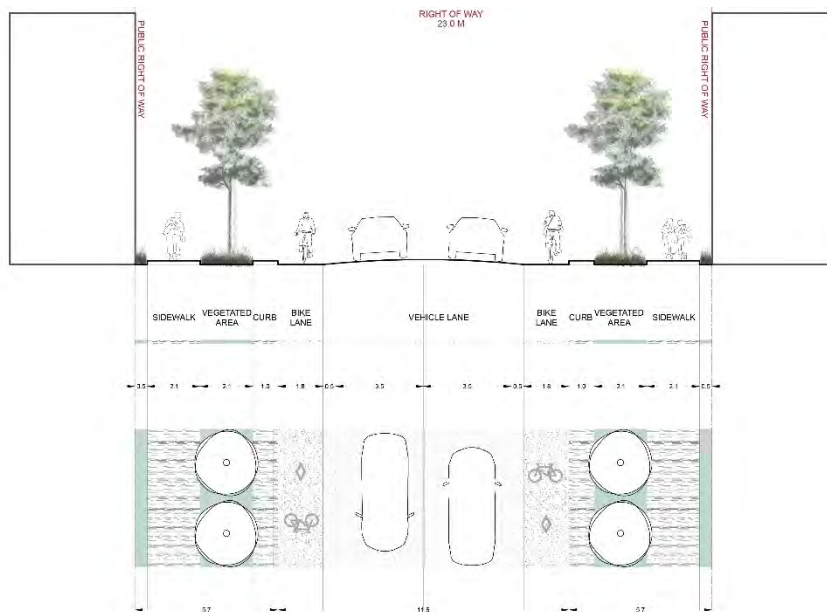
Existing Mixed-Use Neighbourhood Complete Street Cross-Section
